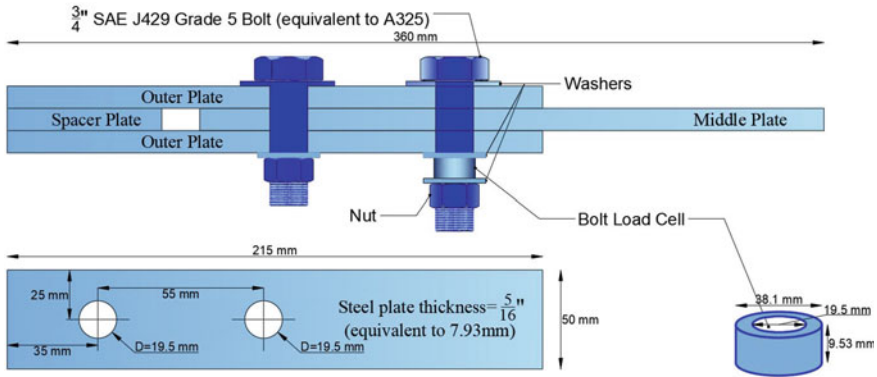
Double lap joint bolted specimen used for fatigue tests
